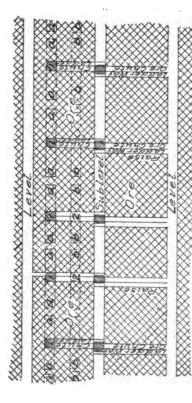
Longitudinal Section of Orebody Between Two Levels—Showing how preparations for mining are made. Mining will
